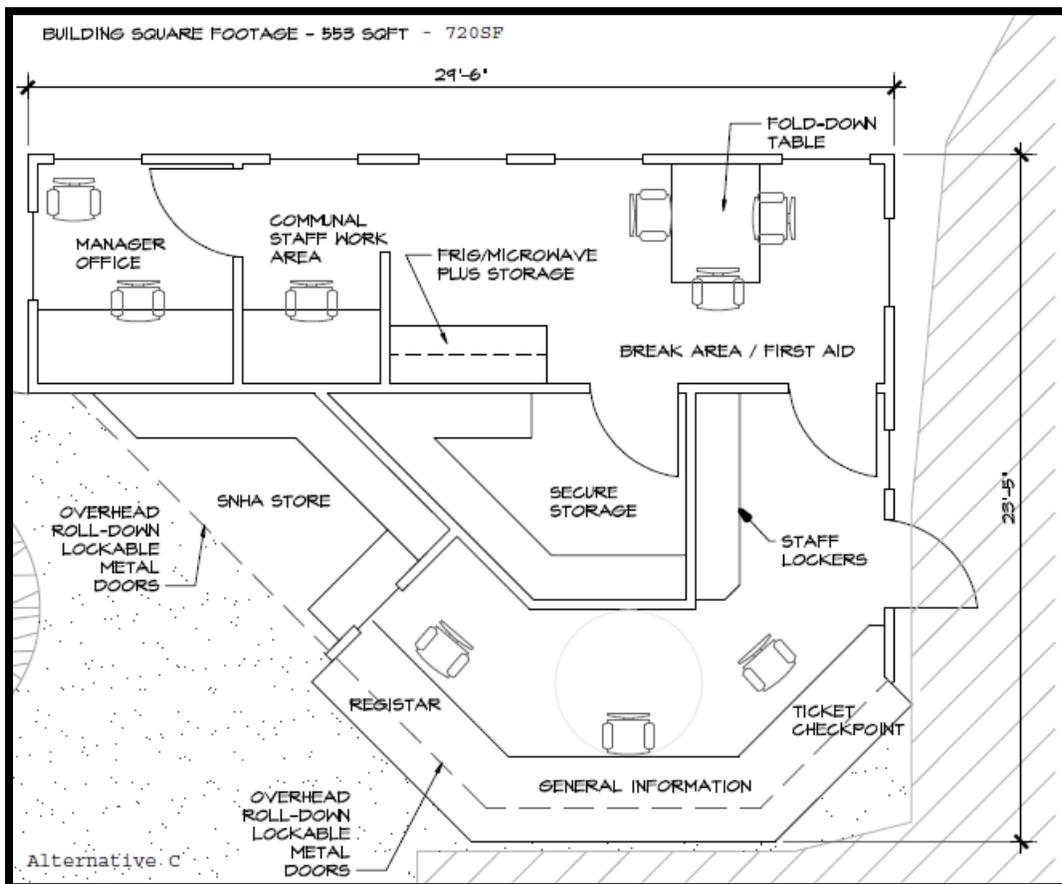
Layout of 720 square foot building (Kroonenberg 2013)
